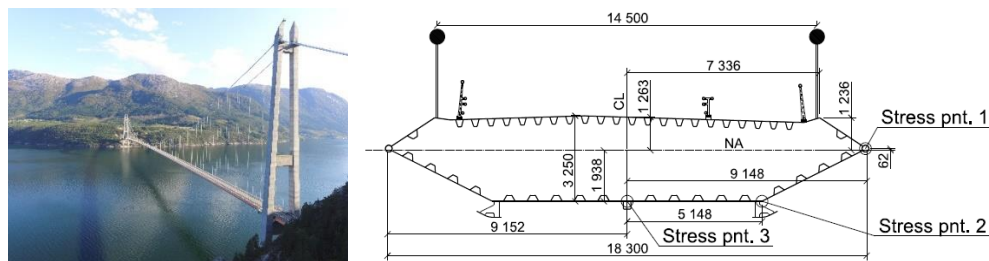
The Hardanger Bridge and the typical girder cross section (Picture and drawing by the authors)
